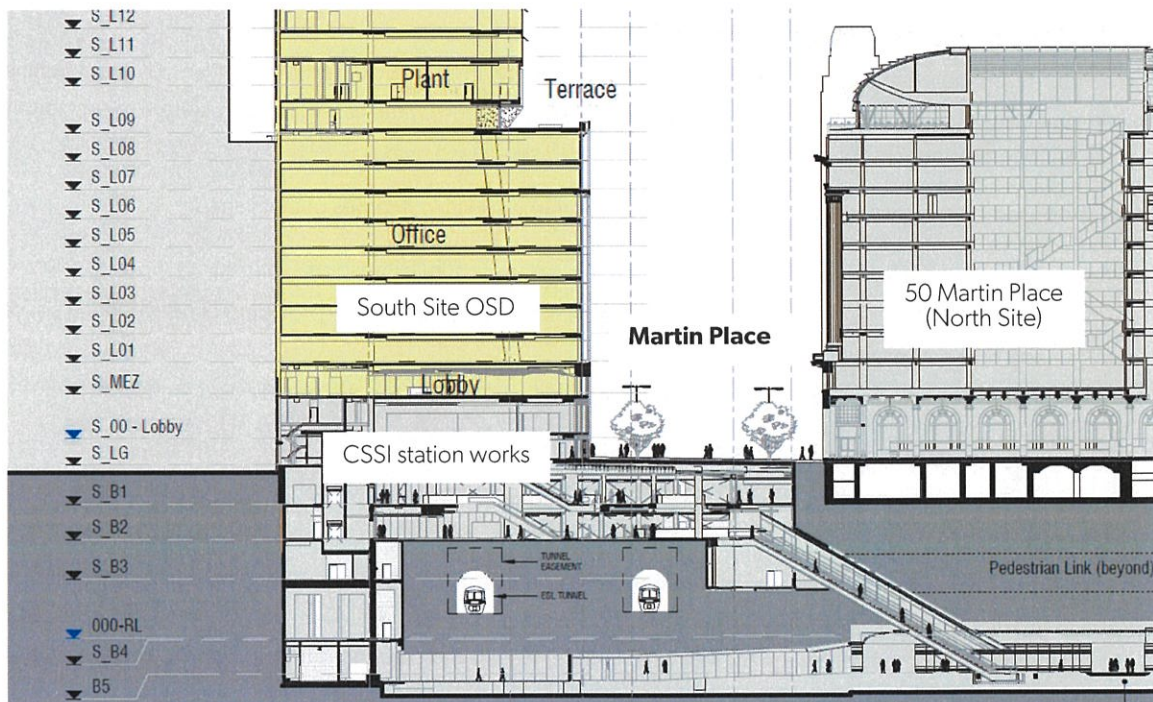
| Section Plan showing proposed OSD above CSSI station works (Source: Applicant's RtS)
